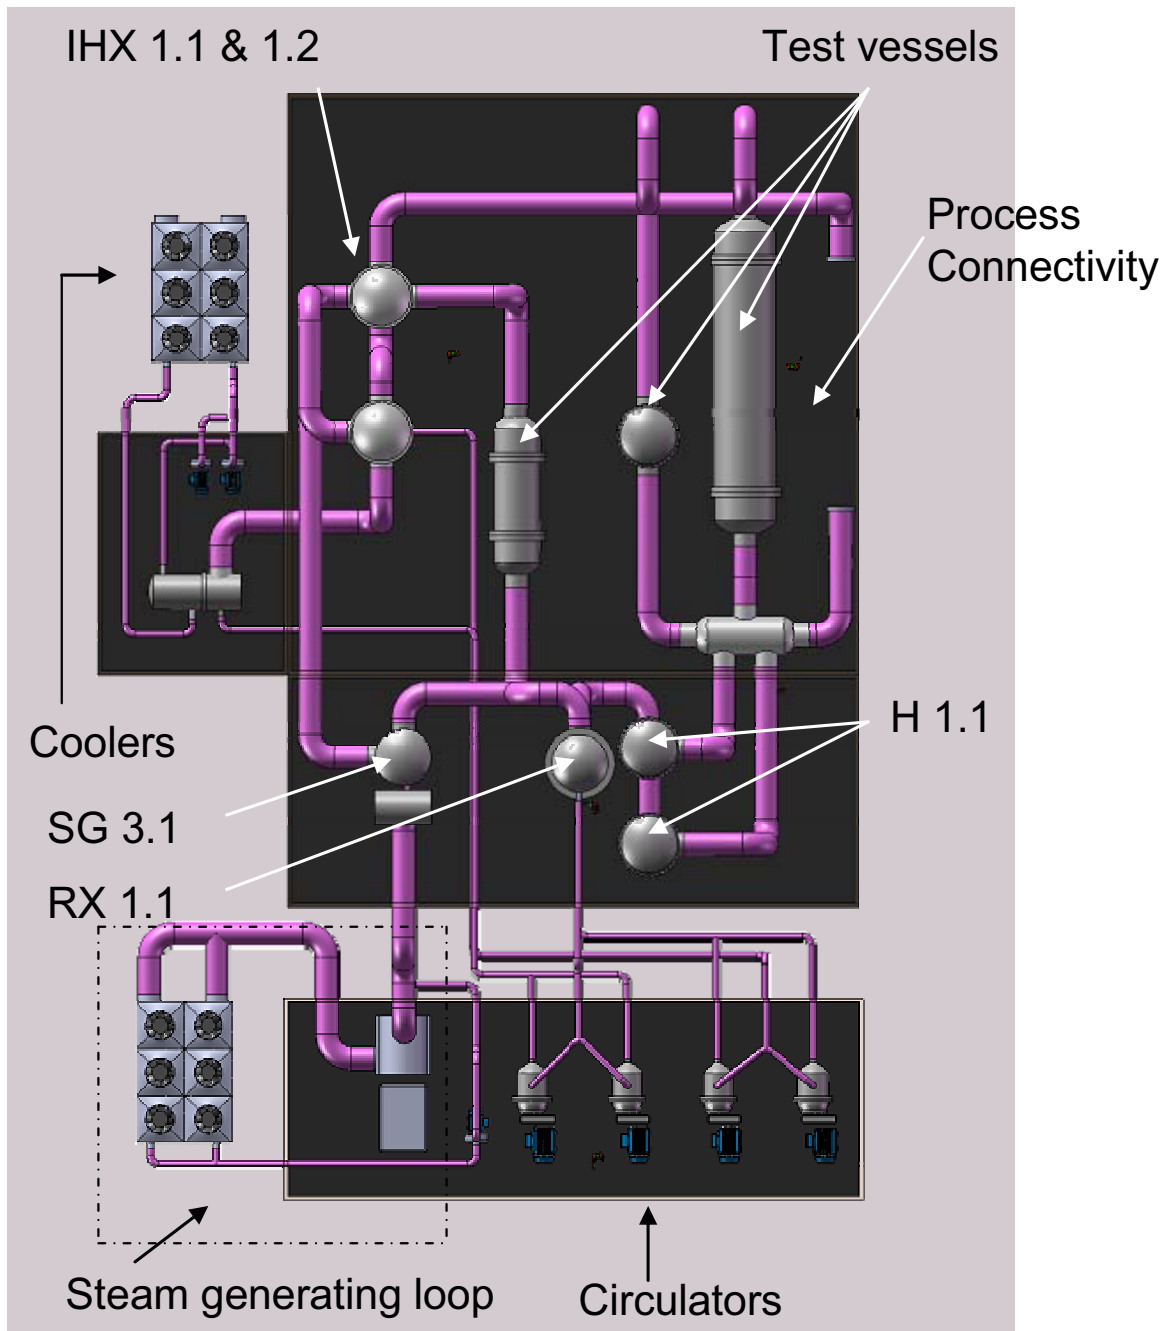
Floor plan layout of Concept 2(CQL 2) indicating major components as can be found in the Process Flow diagram
